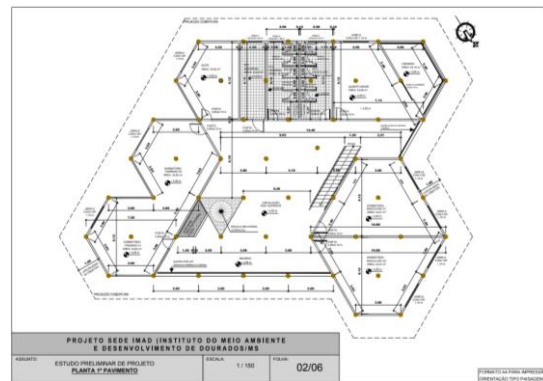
IMAD’s Collective Centre for Development proposed building, upper floor plan.
